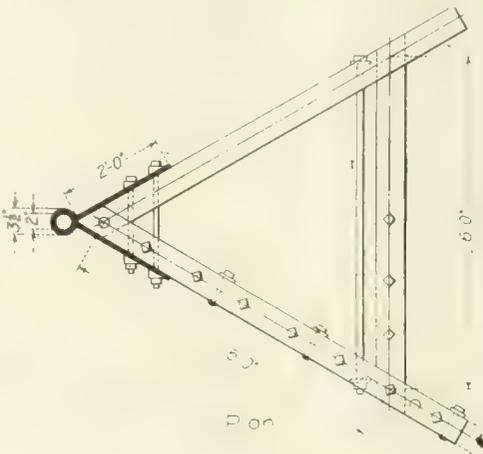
Spike-tooth Harrow for Use in Gravel Road Construction.
